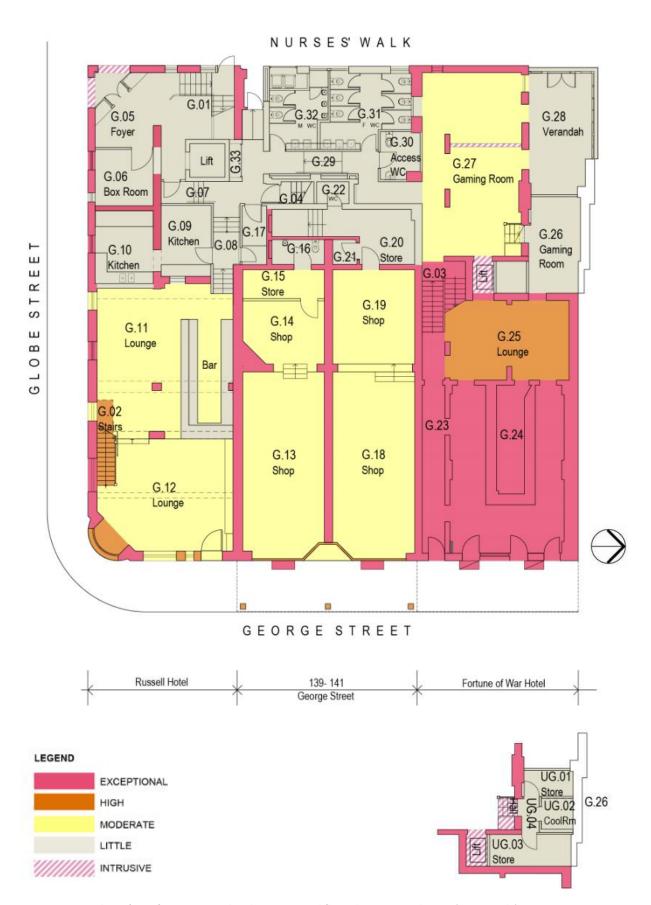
Grading of significance, ground and upper ground floor plans, TKD Architects (not to scale)
